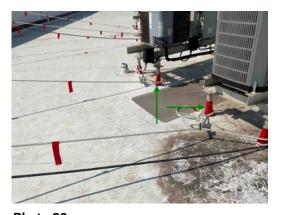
Roof - View of red tape installed around HVAC Equipment Platform legs for protection.
